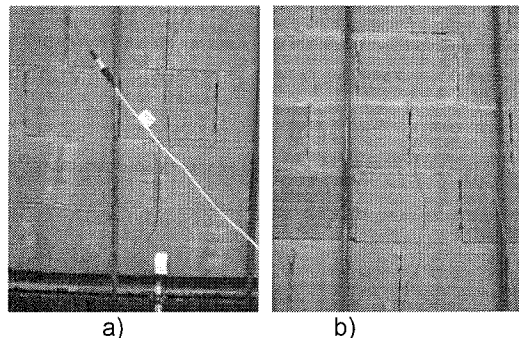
a) Crack opened at half span between the first and the fourth row of bricks; b) Crack opened at half span, between the fourth and the eighth row of bricks
